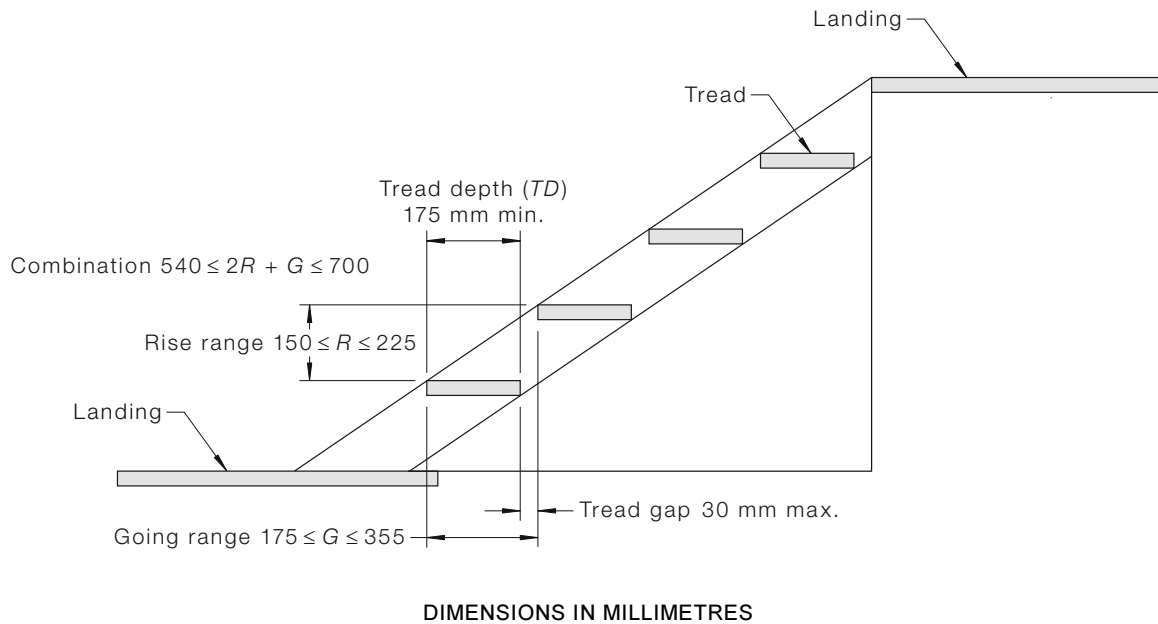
SCHEMATIC OF TYPICAL TEMPORARY STAIRWAY
